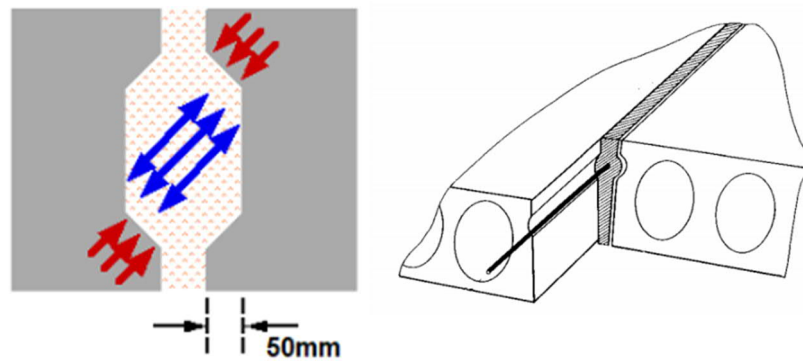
Castellated joint (left); (The Concrete Centre, 2017); longitudinal shear key in a hollow core slab (right); (International Federation for Structural Concrete, 2008, p. 6)
